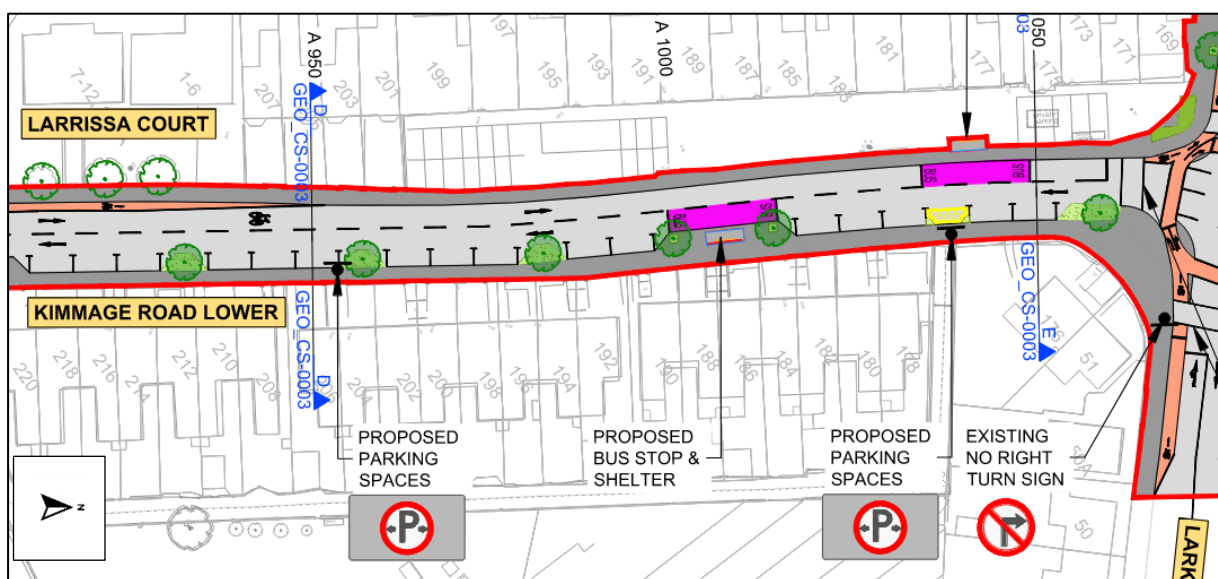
Proposed Scheme on Kimmage Road Lower South of Sundrive Road Junction
